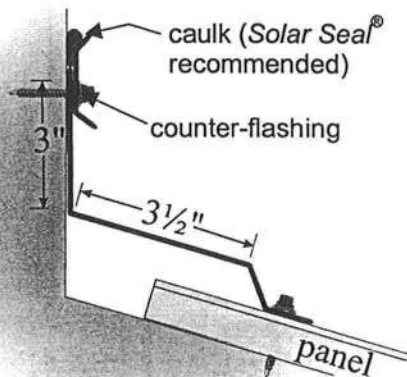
As with the ridge cap, the ENDWALL FLASHING above can be sealed using outside closures.
